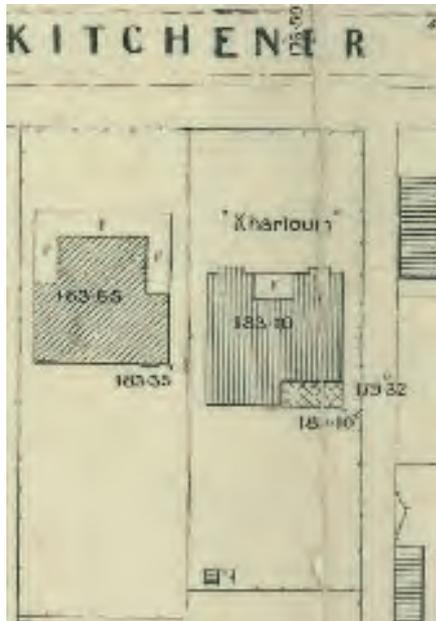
Detail from MMBW Detail Plan no 2954, 1926, showing 'Khartoum' at 8 Kitchener Street. (Source: State Library Victoria).
